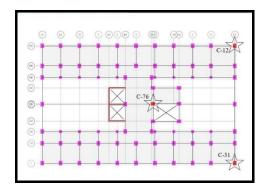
Plan of a typical G+9 Storey RC Building Showing Removed Column Location Cases (C-31, C-12, and C-76)
